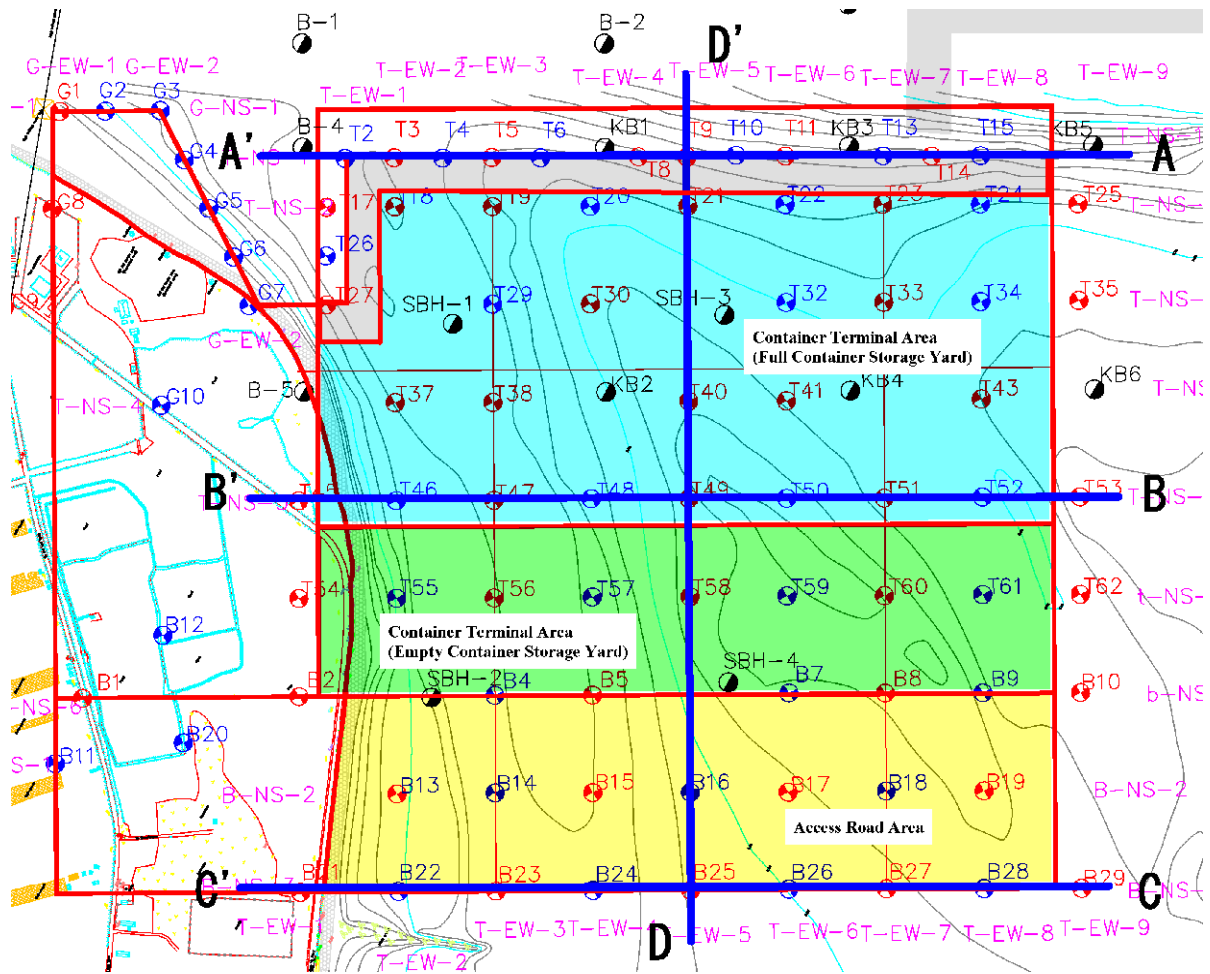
Location of Boring Points for Terminal Area, Access Road Area and Public Facility Area
